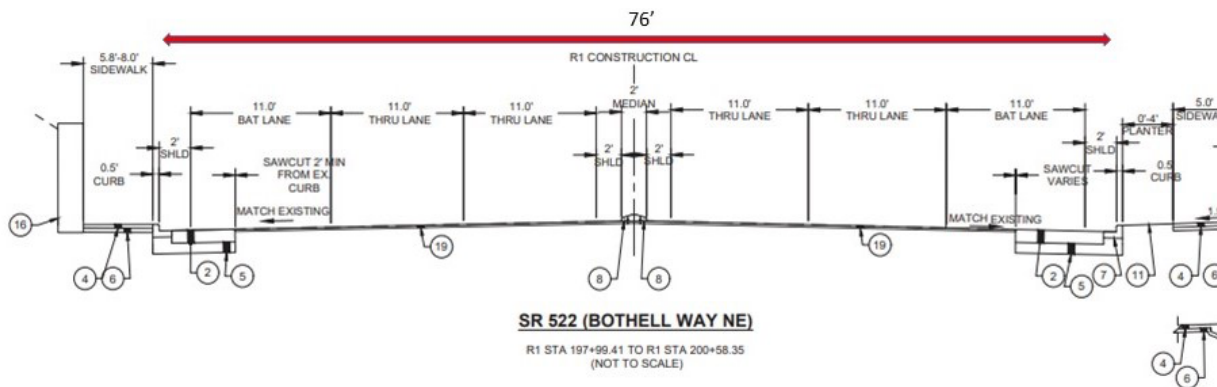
(Sheet 084) Proposed pavement cross-section for 6 traffic lanes
